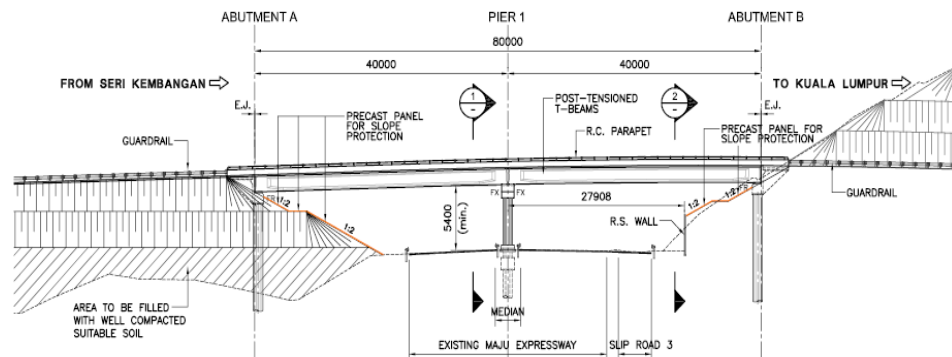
Elevation of span configuration of Seri Kembangan Bridge.
